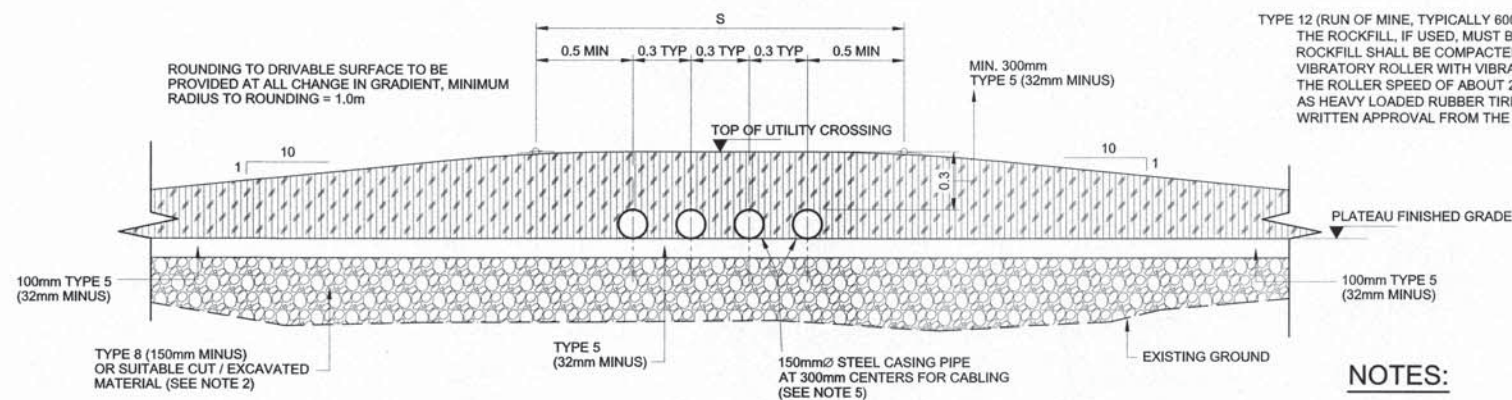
CABLE AND PIPE CASING UNDER DRIVABLE SURFACE
